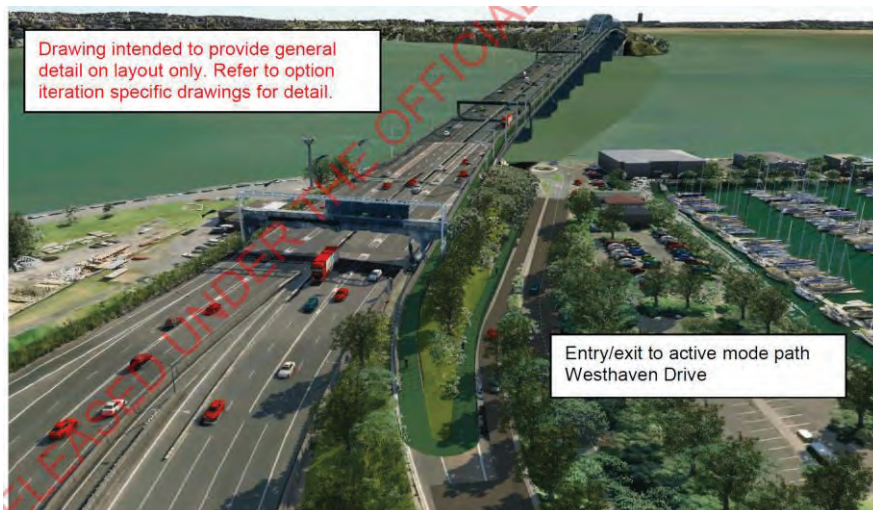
Westhaven Drive Access/ Egress. Local road realigned / repurposed Shelly Beach Rd off ramp may need to be closed.
